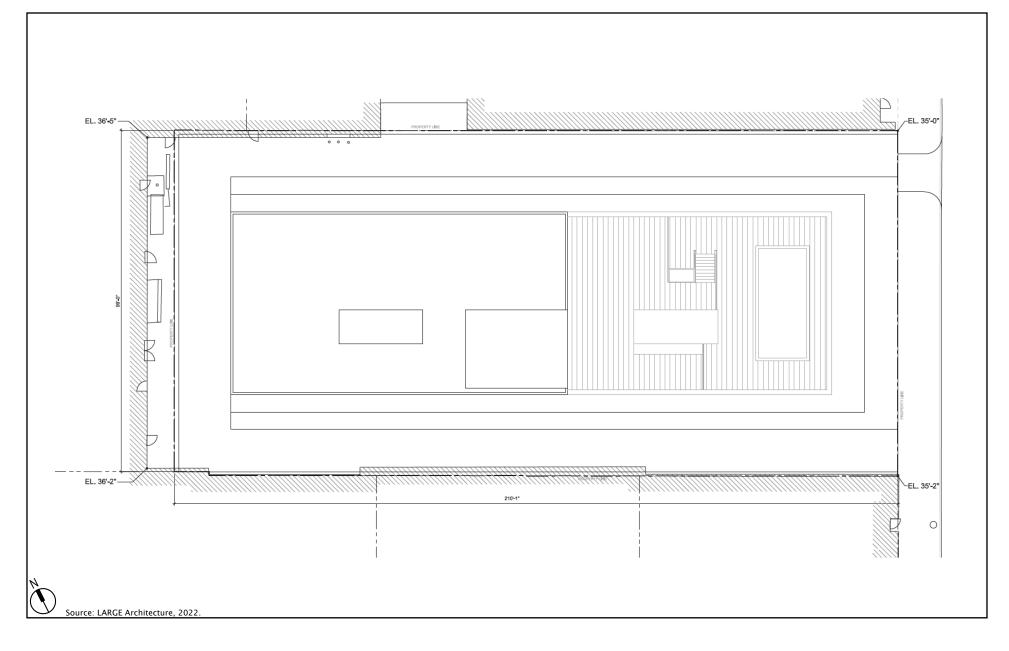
Roof Plan — 1431 Franklin Street Residential Project A section of the building is shown in Figure IV-18. Project elevations displaying these three sections are provided in Figures IV-19 and IV-20.
